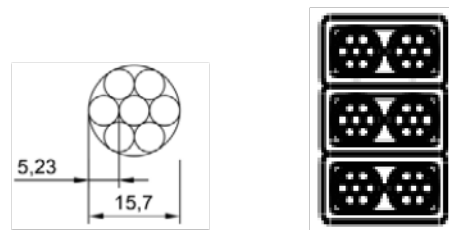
7-wire prestressing steel strand (left) and prestressing cable with 3 HDPE tubes and overall 6 strands
